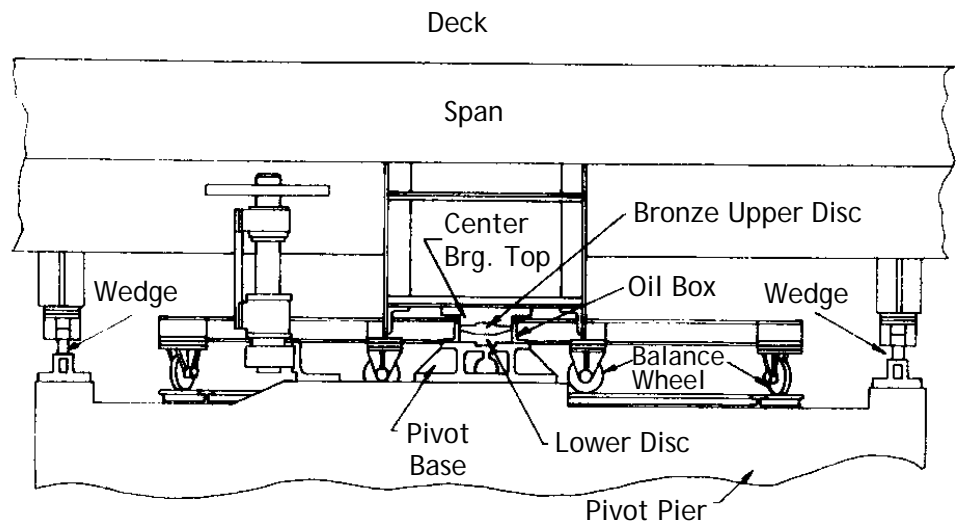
Layout of Center-Bearing Type Swing Span with Machinery on the Span
